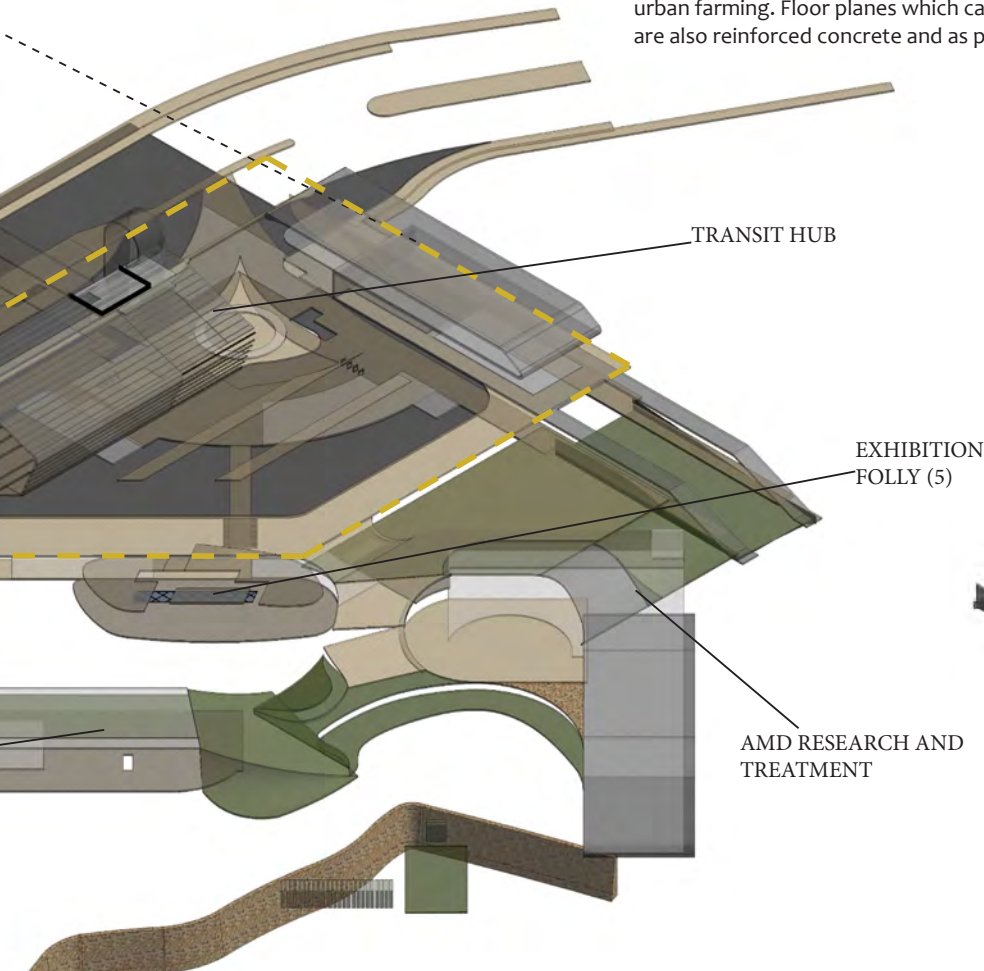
SECONDARY STRUCTURAL WALLS AND COMPONENTS (Author, 2017)
